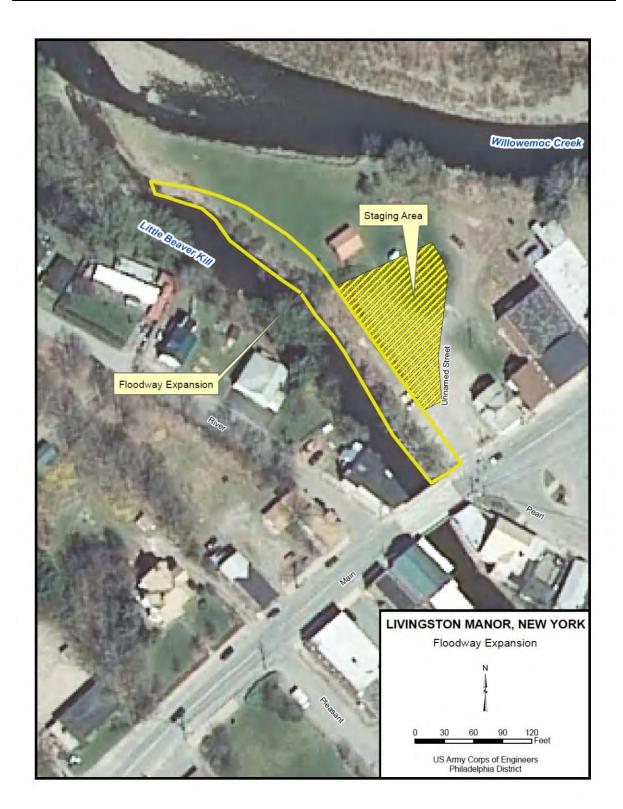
Plan H – Widening of the Little Beaver Kill floodplain below the Main Street Bridge.
